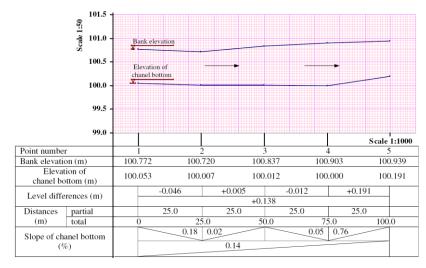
Longitudinal section on the CC<sub>1</sub> canal, upstream of the culvert
